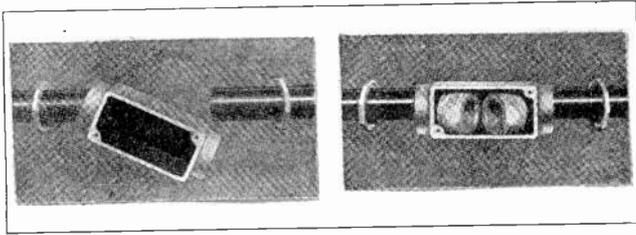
This view shows the convenient manner in which threadless fittings can be installed with conduit.
